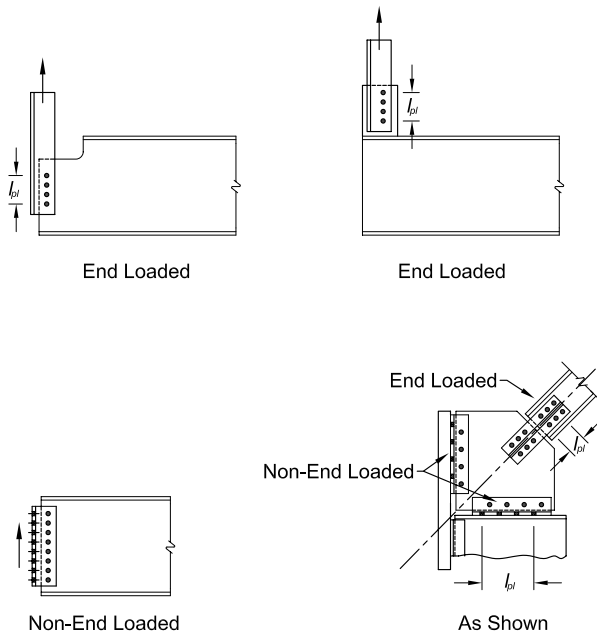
End loaded and non-end-loaded connection examples;
